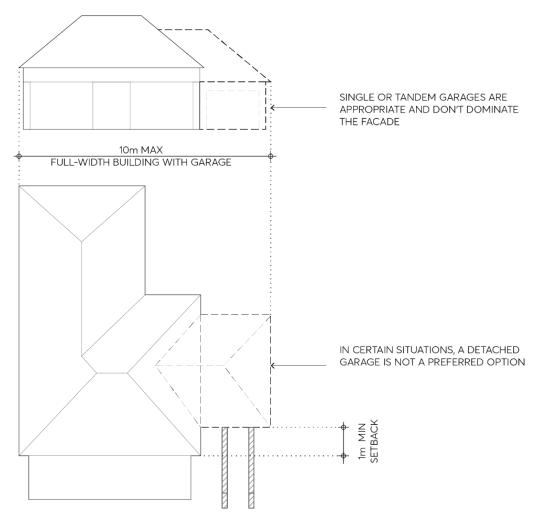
Alternate garage scenario where a detached addition is not possible
